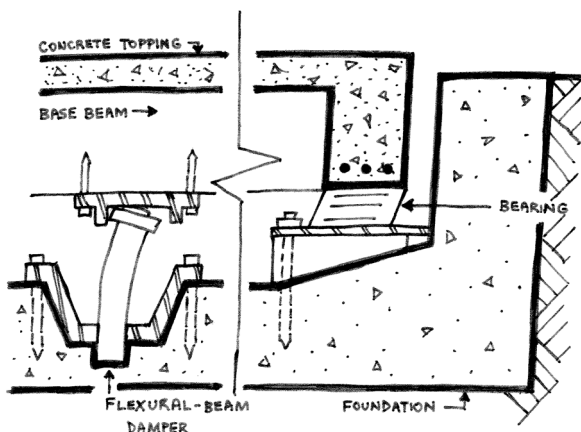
Typical section of a base-isolated floor slab. Note the two layers of concrete.
